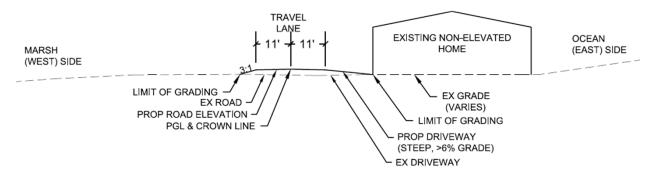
Typical driveway tie-in section "E": non-elevated house on east side of road with insufficient driveway length.
